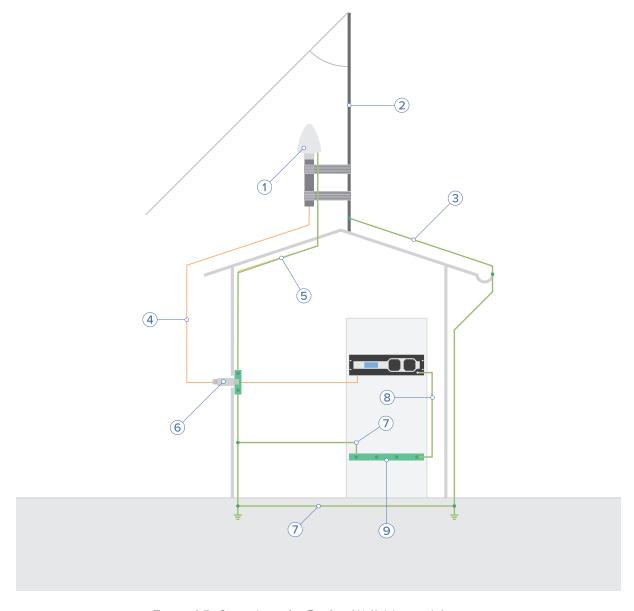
Grounding of a Roof or Wall-Mounted Antenna
